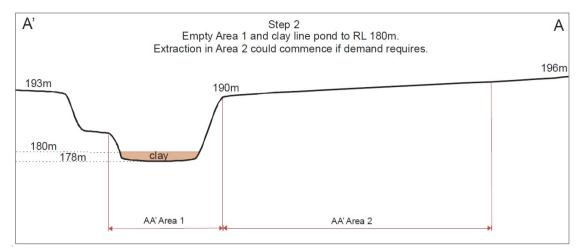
Section showing the location of the clay deposit to seal the floor of the dam.
